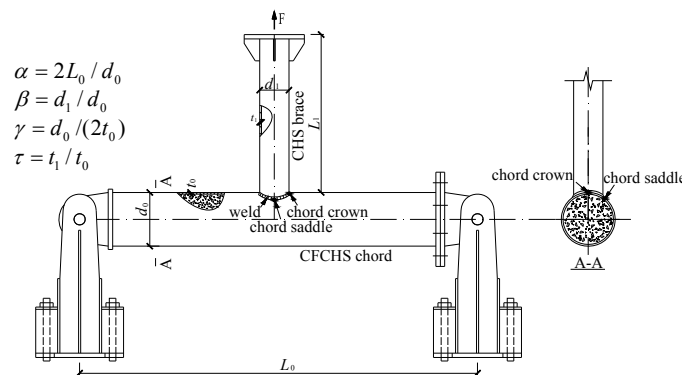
Welded CFCHS T-joint Specimen and Static Test Setup
